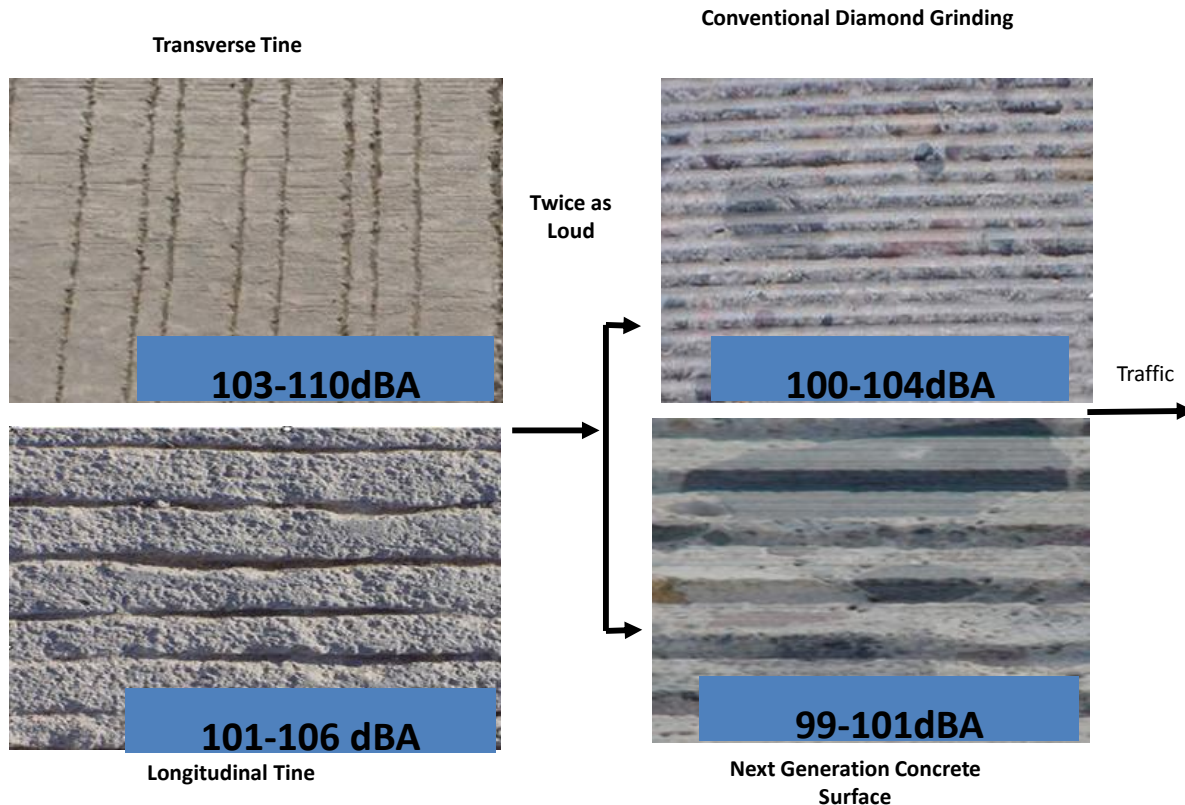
Typical OBSI Levels Measured on Each of the Pavement Textures
